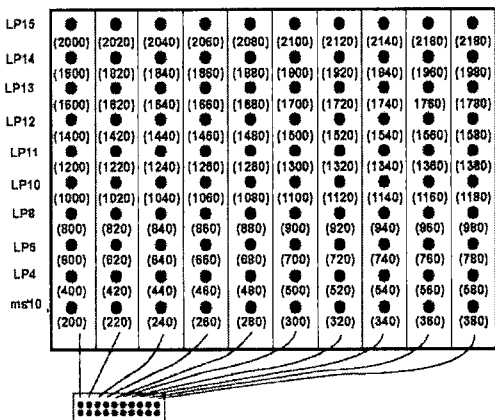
10-row shot with the sequential blasting machine(100 holes)
